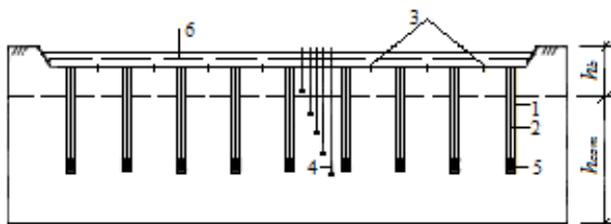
Schematic section of the pad when soaking through the excavation: 1 - drainage-explosive well; 2 - the explosive column; 3 - surface stamps; 4 - deep brand; 5 - explosive substance; 6 - water column;  $h_{cam}$  – sealing, the thickness of the soil;  $h_b$  – buffer non compacted area
